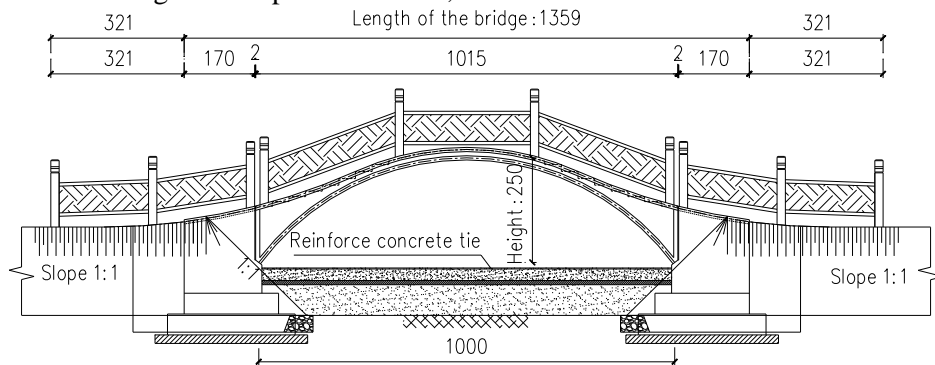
Elevation view of the pedestrian UHPC arch bridge in China (unit: cm)
